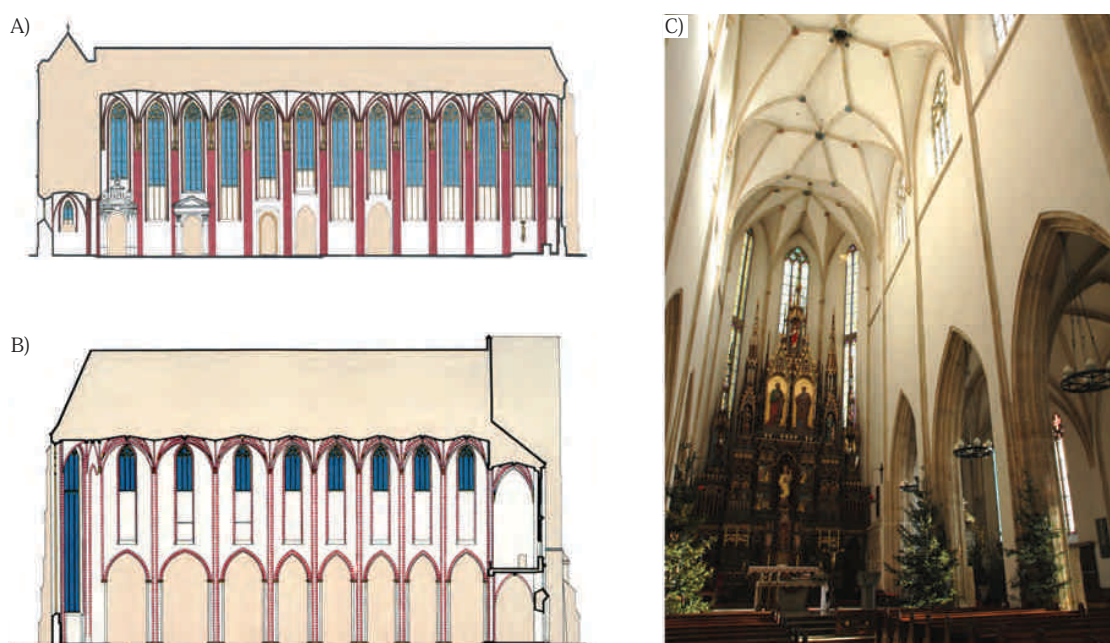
Internal elevations of churches from the 14<sup>th</sup> century. A) Wrocław – the Church of the Blessed Virgin Mary on the Sand, longitudinal section by the north nave (by E. Małachowicz), B) Brzeg – the Church of St. Nicholas – longitudinal section (by O. Czerner and E. Małachowicz), C) Strzegom – the Parish Church, interior (photo: H. Golasz-Szołomicka)
